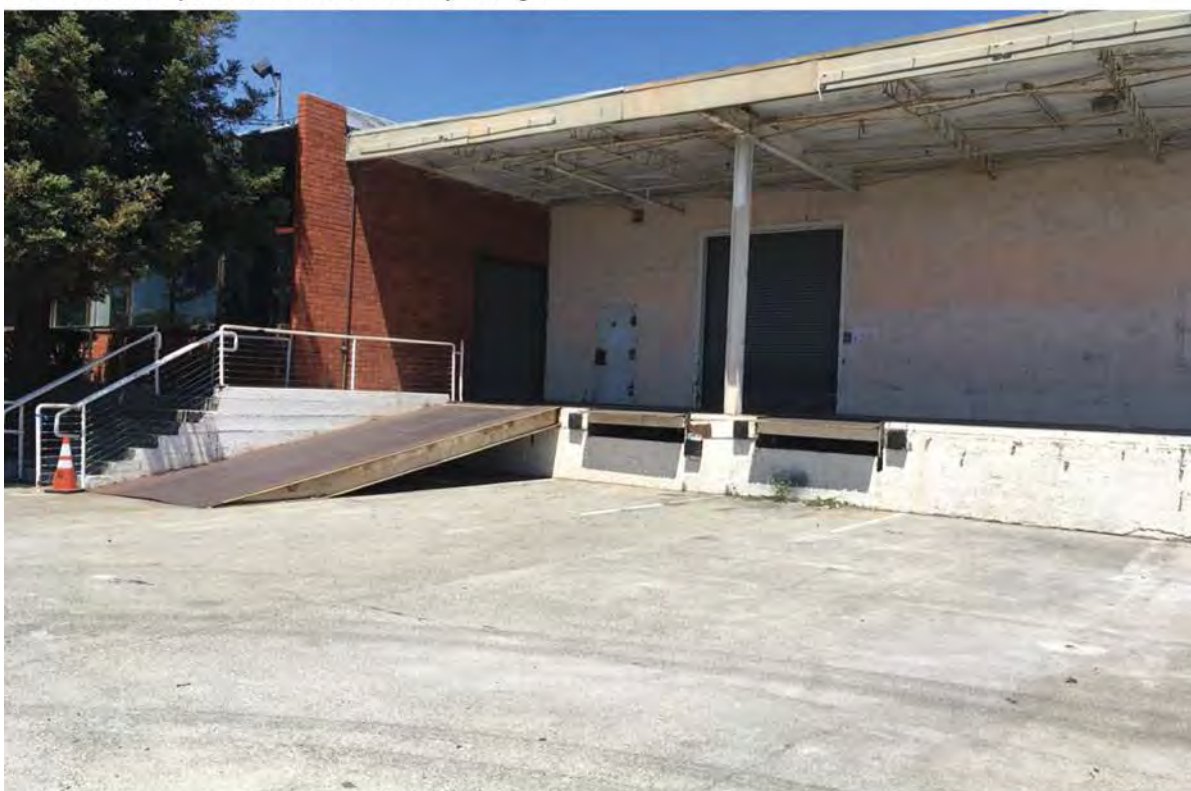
View of existing unused loading dock on the southwestern corner of the project site from Alvarado Street parking lot.
